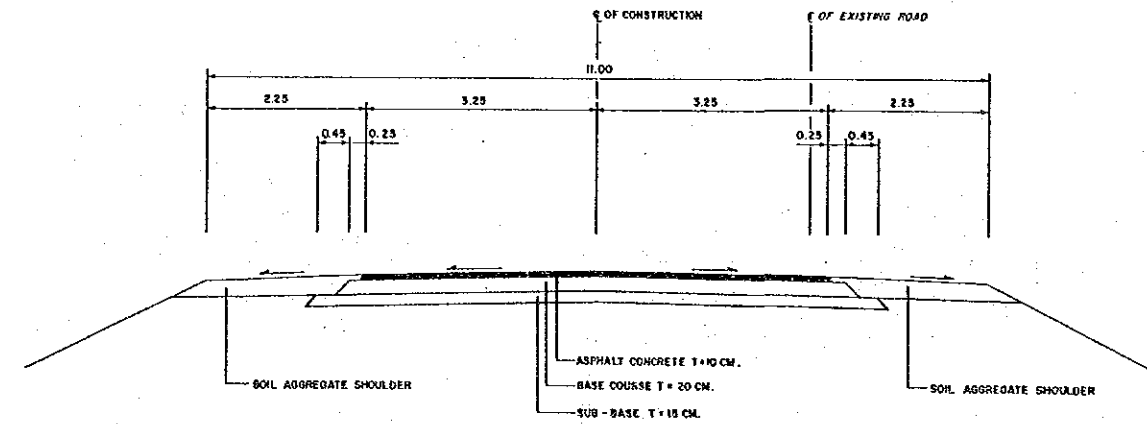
FIGURE TYPICAL PAVEMENT STRUCTURE FOR FLEXIBLE PAVEMENT IM-12
